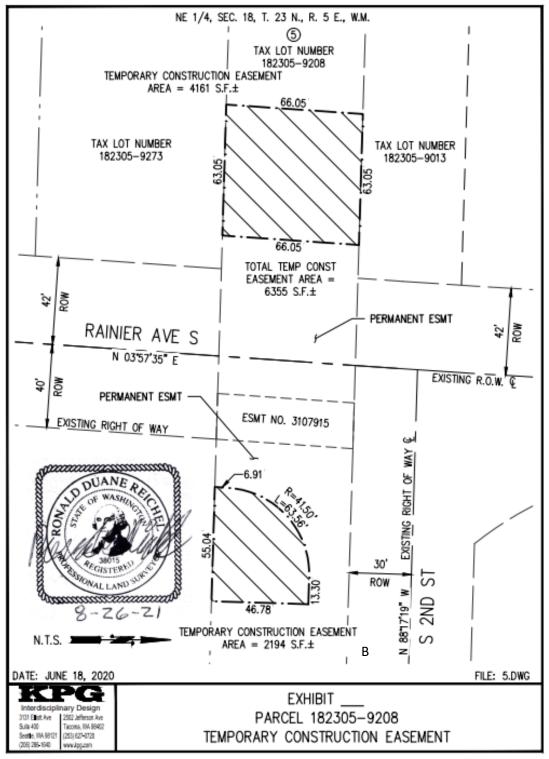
EXHIBIT B TEMPORARY CONSTRUCTION EASEMENT AREAS
